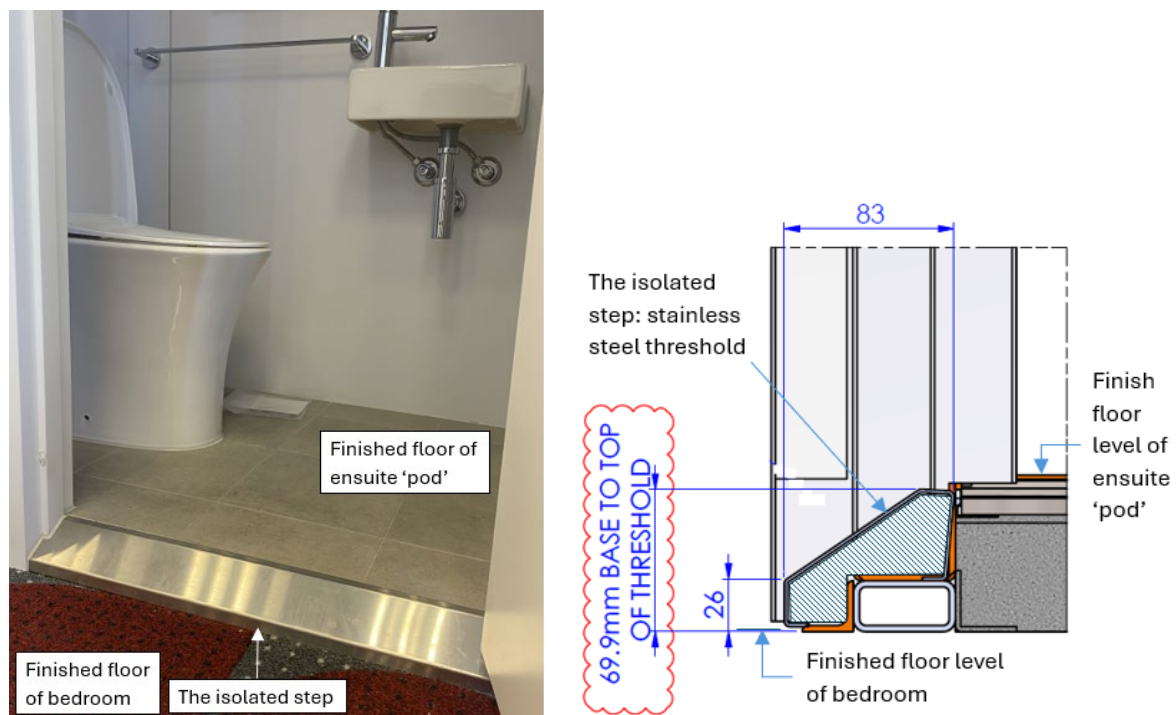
The bedroom and ensuite 'pod' arrangement with isolated step
